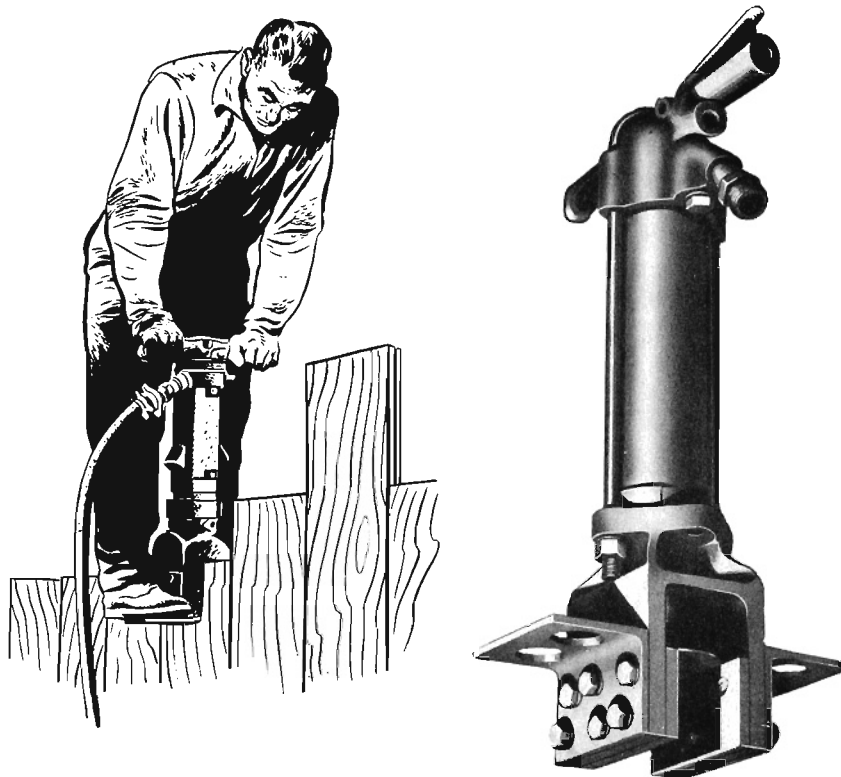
Pneumatic paving breaker with sheet-piling driver head.
